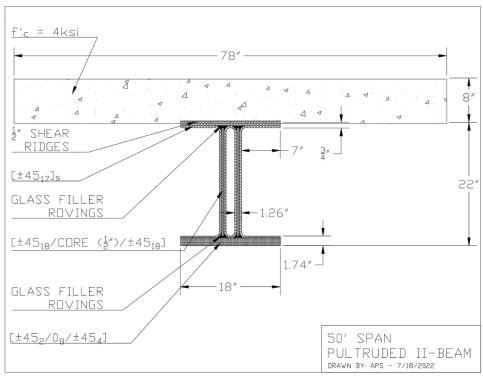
Double-I Girder – 50' Span – Minimum Depth
